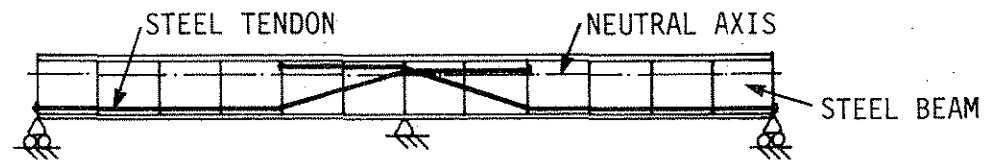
Concept for a two-span, prestressed steel beam, circa 1968.
